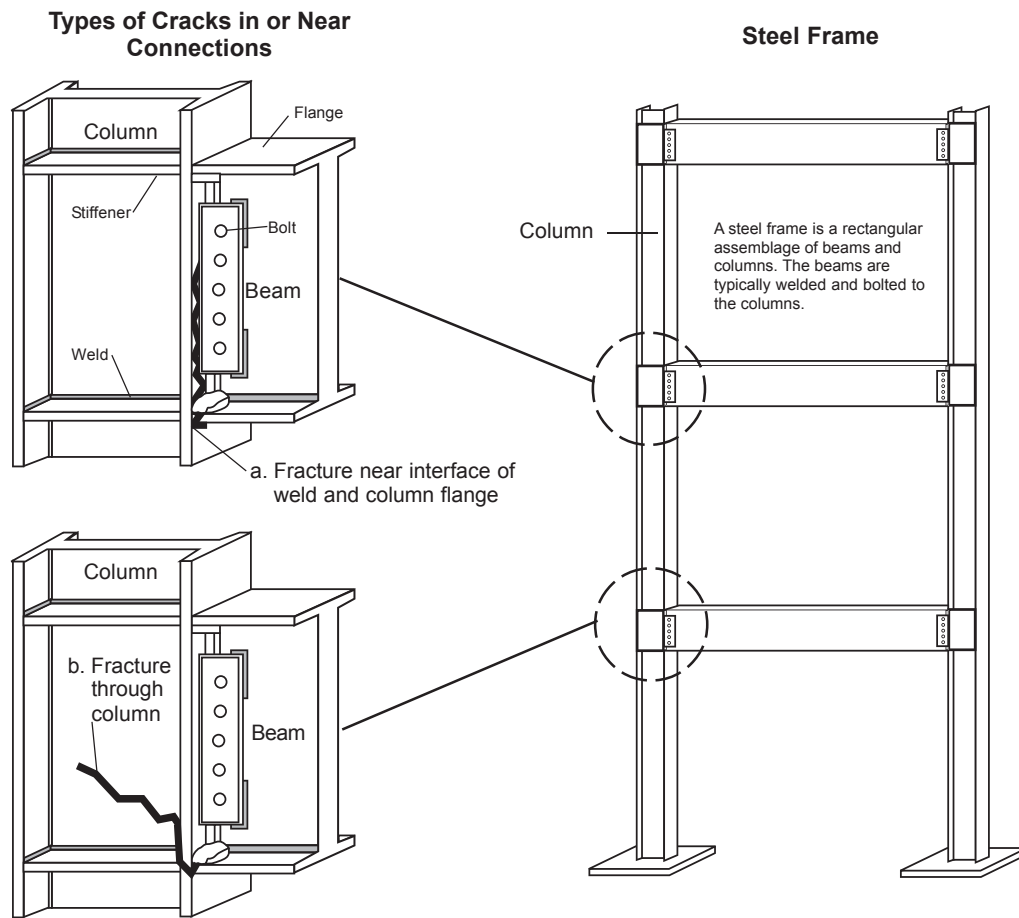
Steel Frame. Two types of cracks found in steel frame buildings after earthquakes.
